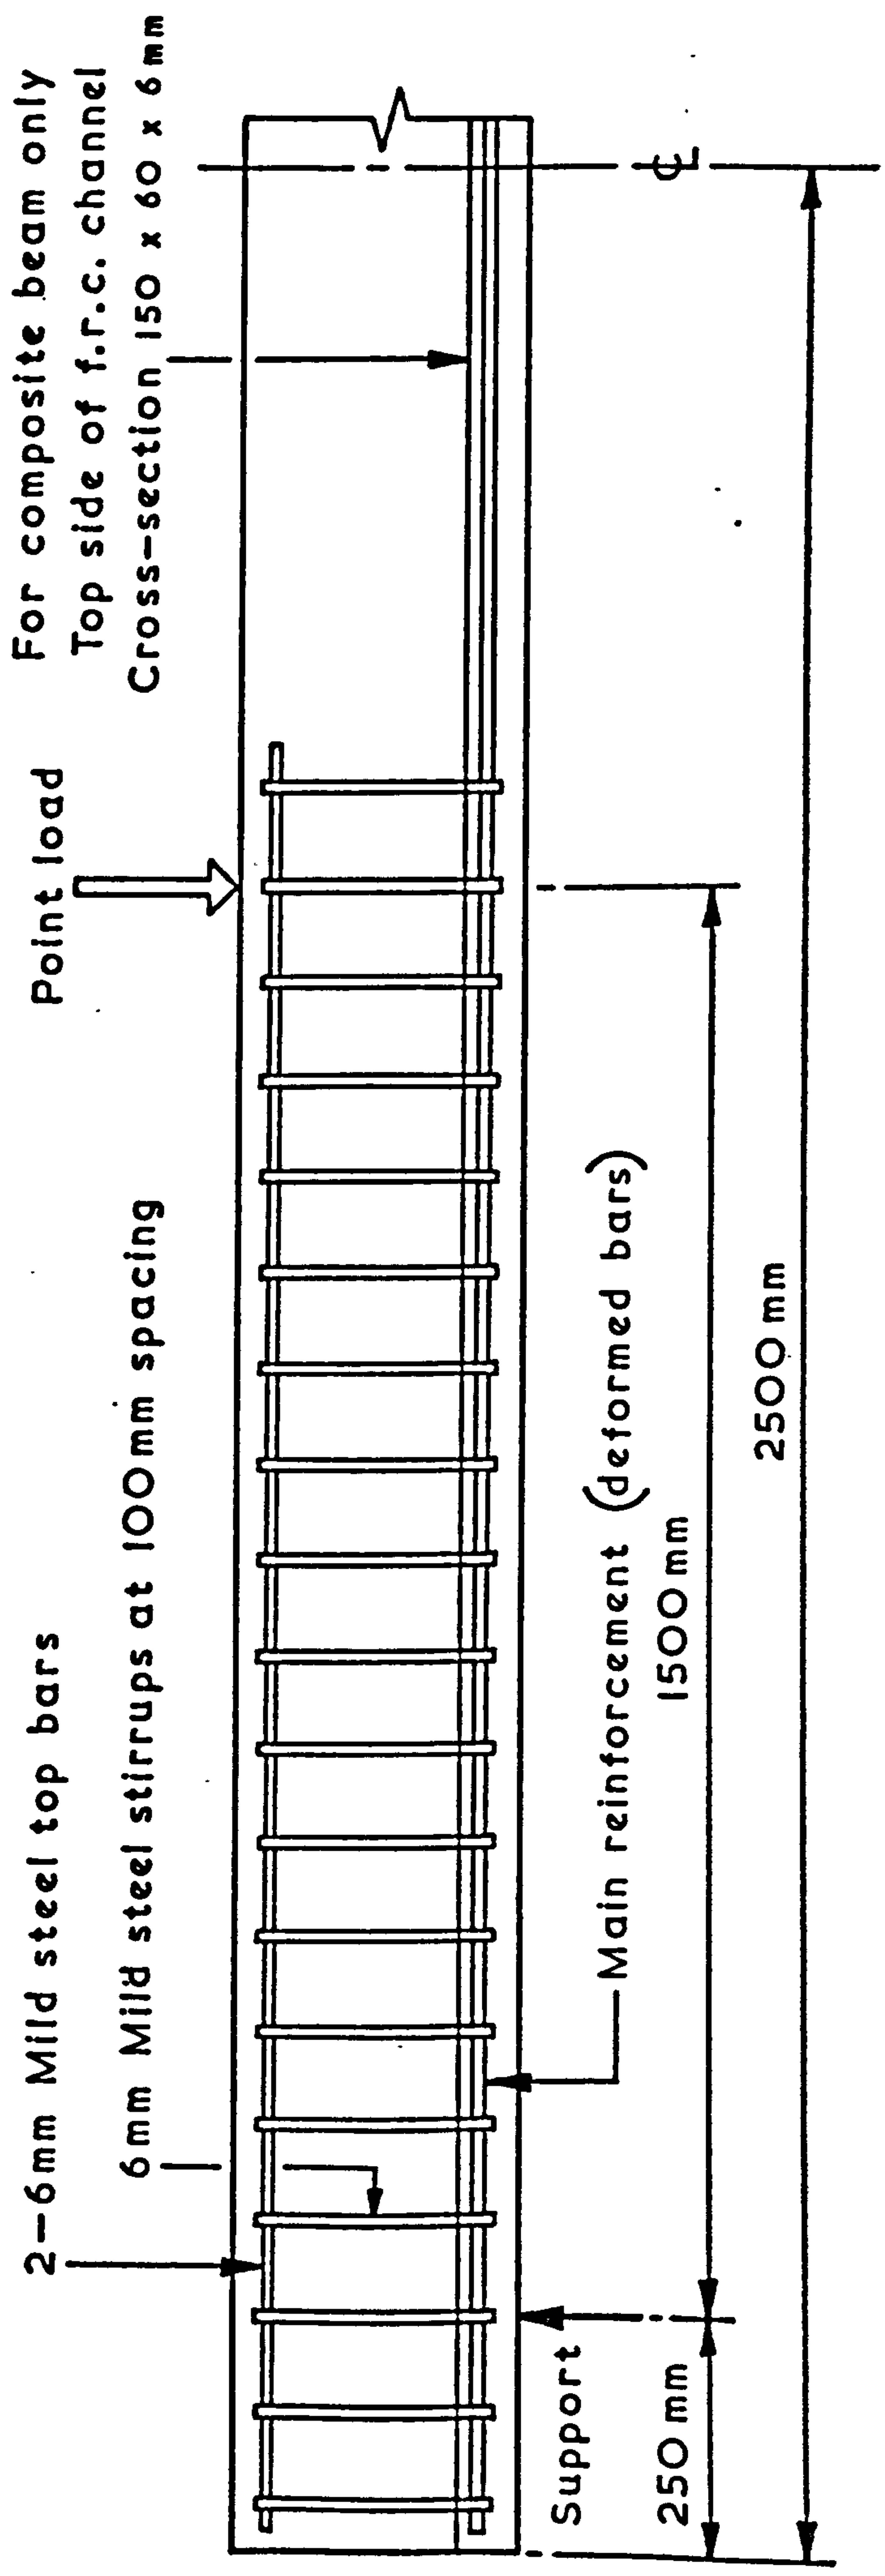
DETAILS OF REINFORCEMENT IN ORDINARY AND COMPOSITE BEAMS (ELEVATION)
